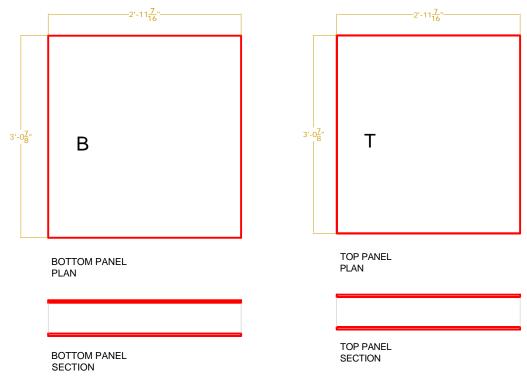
Dimensions for the bottom panel (left) and the top panel (right) [14]
